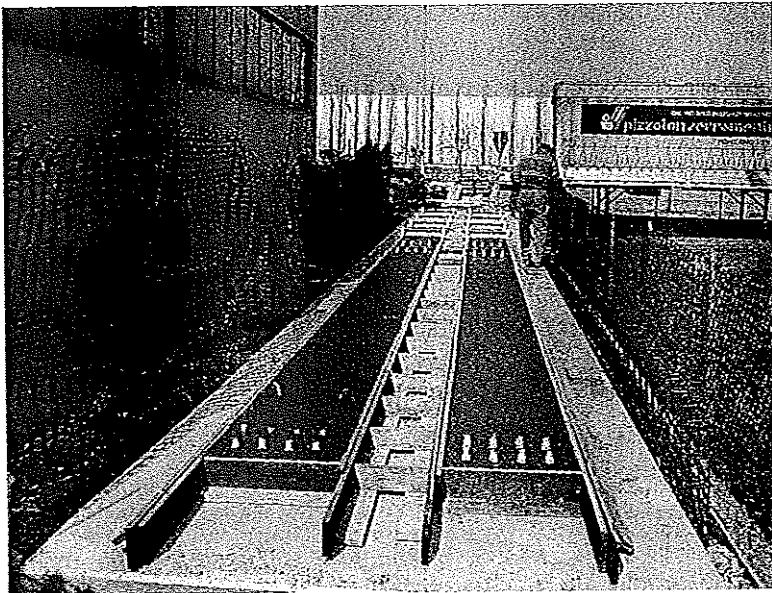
Restrained concrete slabs -8 m (8.8 yd) long, 400 mm (15.6 in) wide and 60 mm (2.3 in) thick- fixed on the foundation at the two ends.
